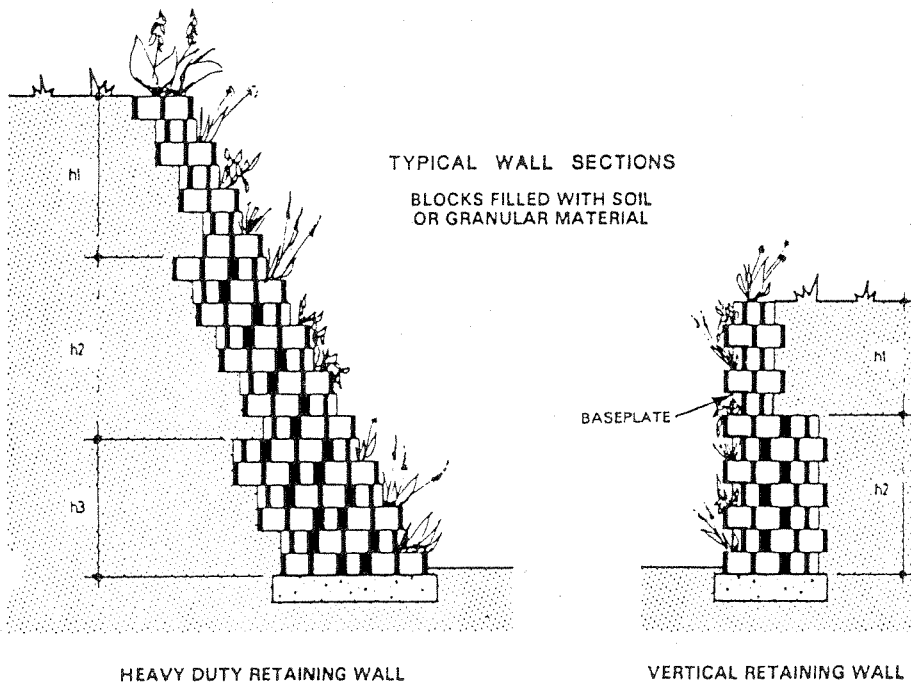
TYPICAL PROPRIETARY WALLS
